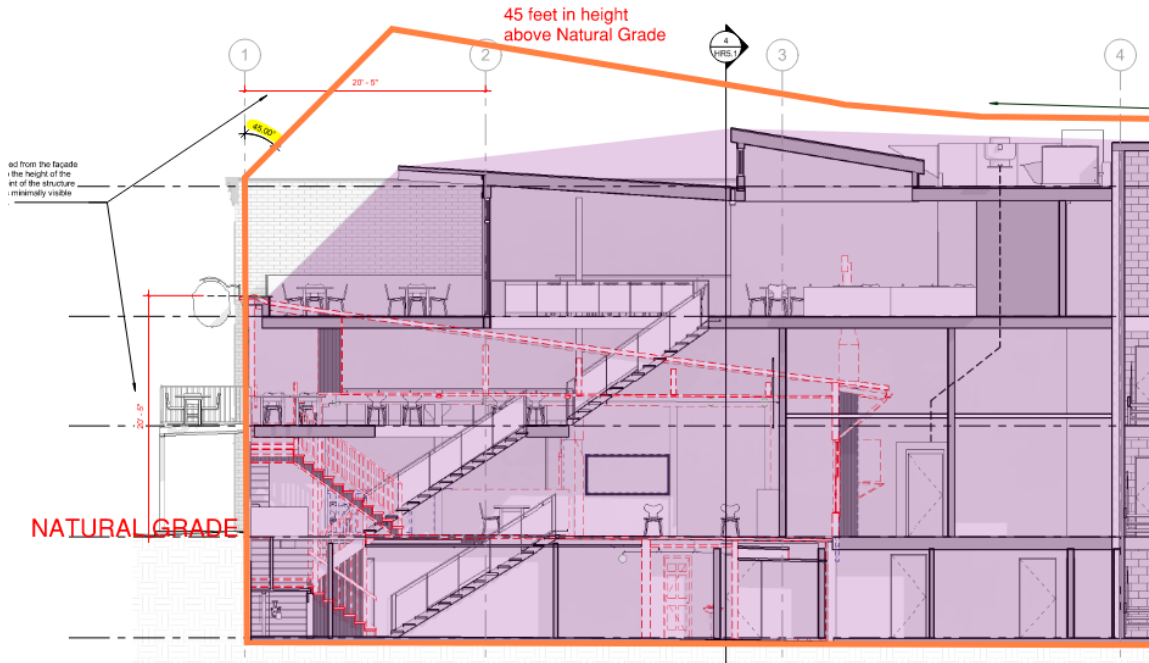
Excerpt from Applicant's plans showing the maximum Building volume highlighted in orange and the proposed Building volume.
